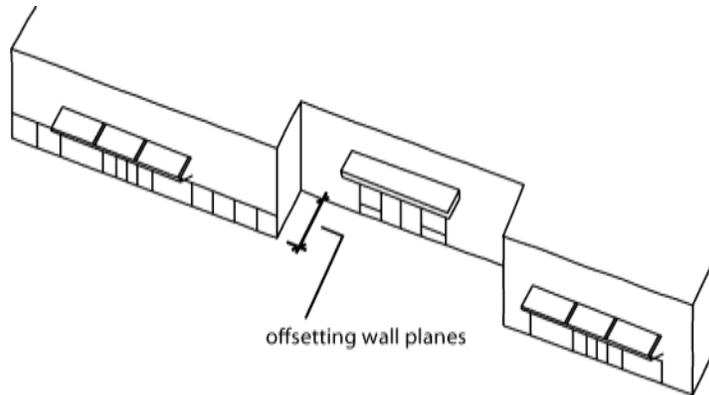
/NC-SR Overlay, Building Design, Exterior Walls
